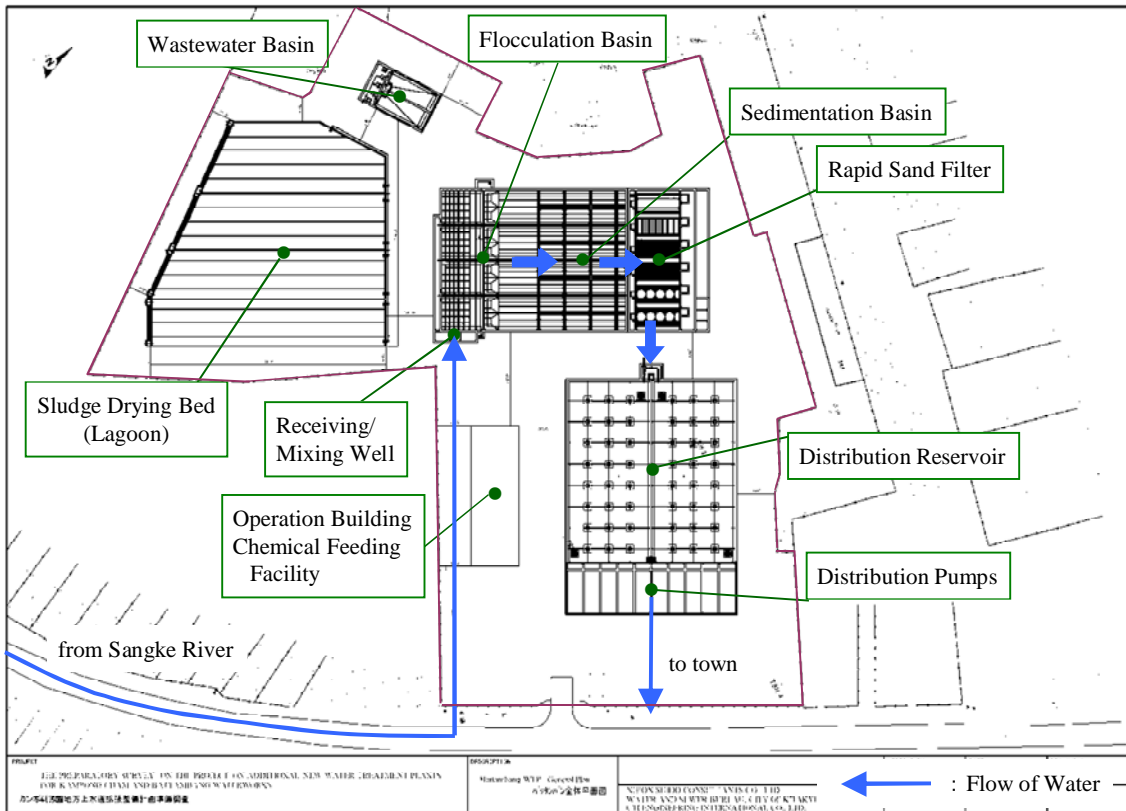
Layout of Kampong Cham Treatment Plant
